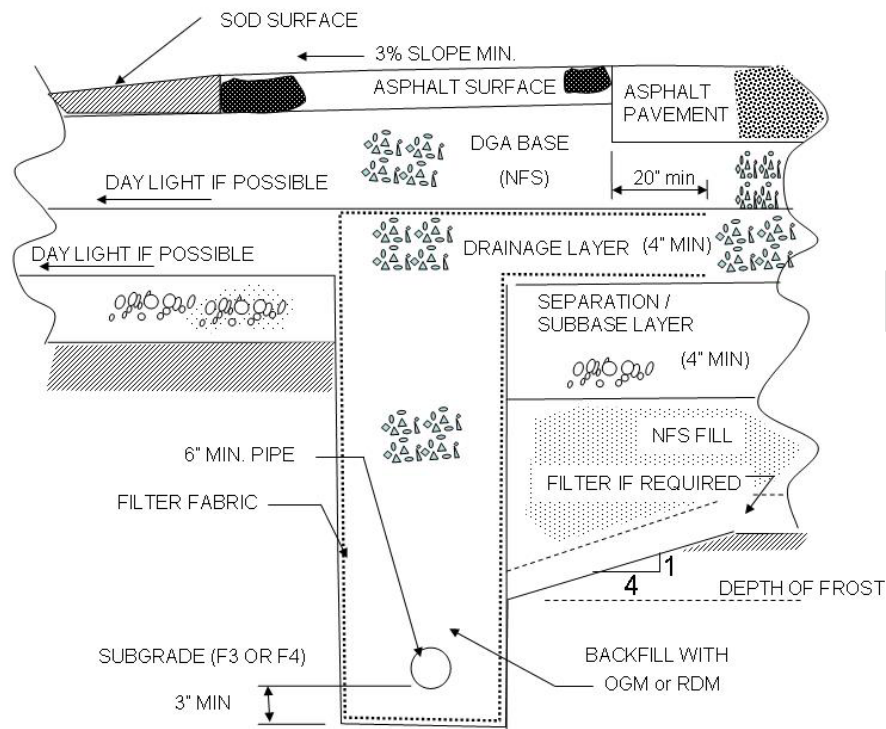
Typical Edge Subdrain Detail for Flexible Pavement
